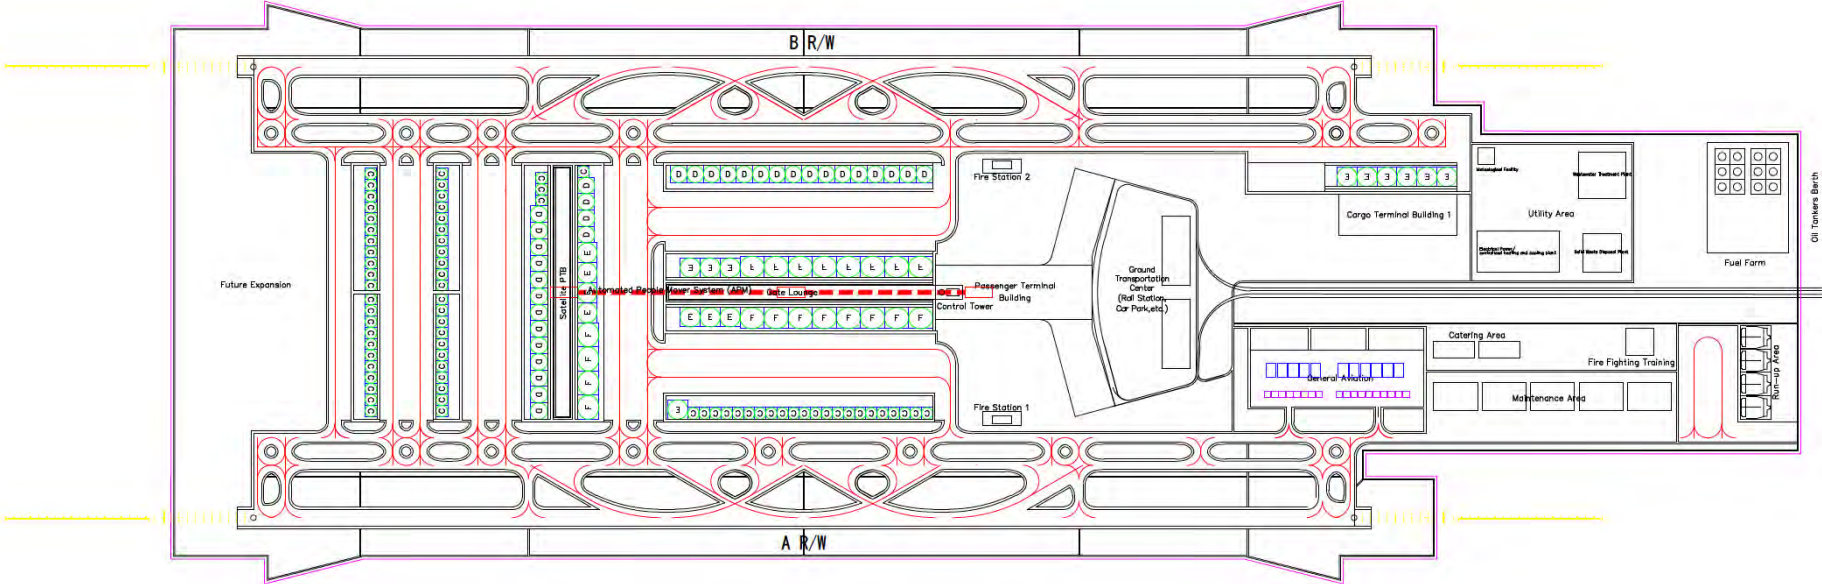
New Airport Layout on Opening Day for Reference
